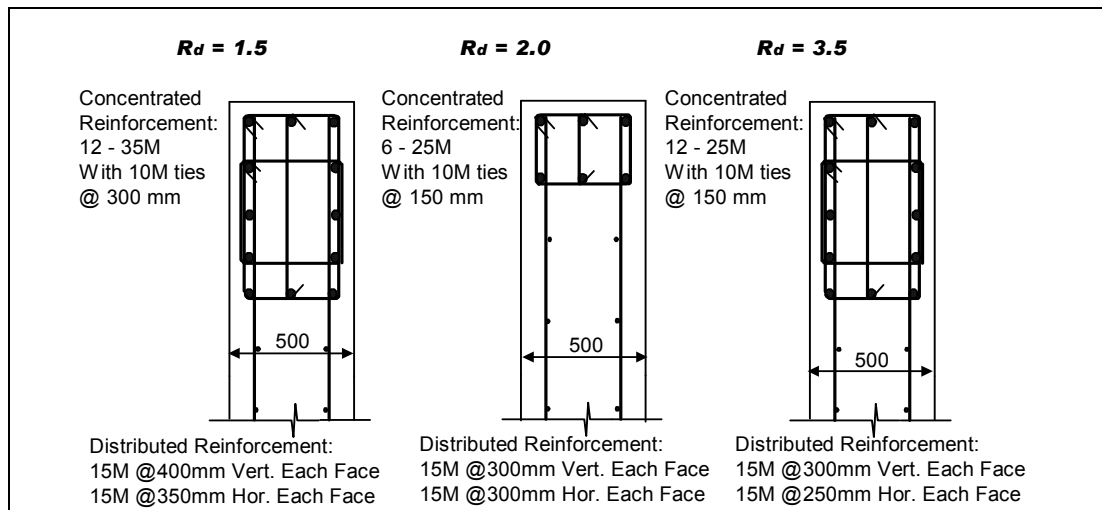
Wall section reinforcement detailing for 15-storey building with 50% fewer walls.
